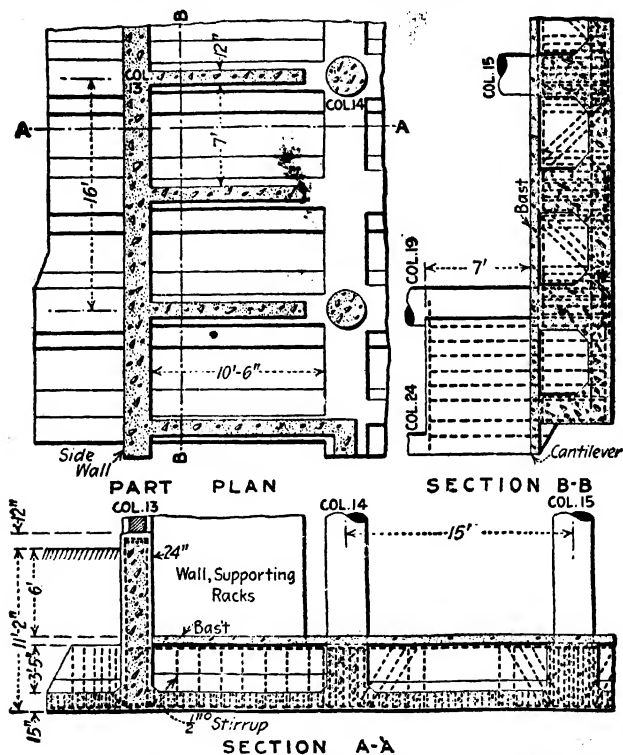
Floating foundation under the Felt & Tarrant Building.
